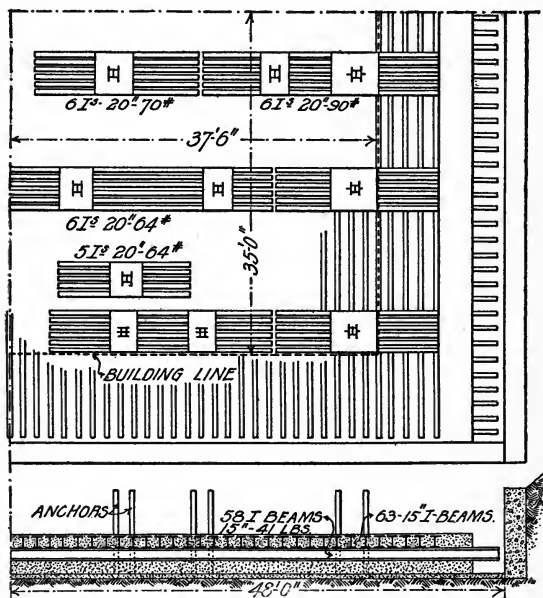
Continuous Grillage, Spreckels Building, San Francisco.
